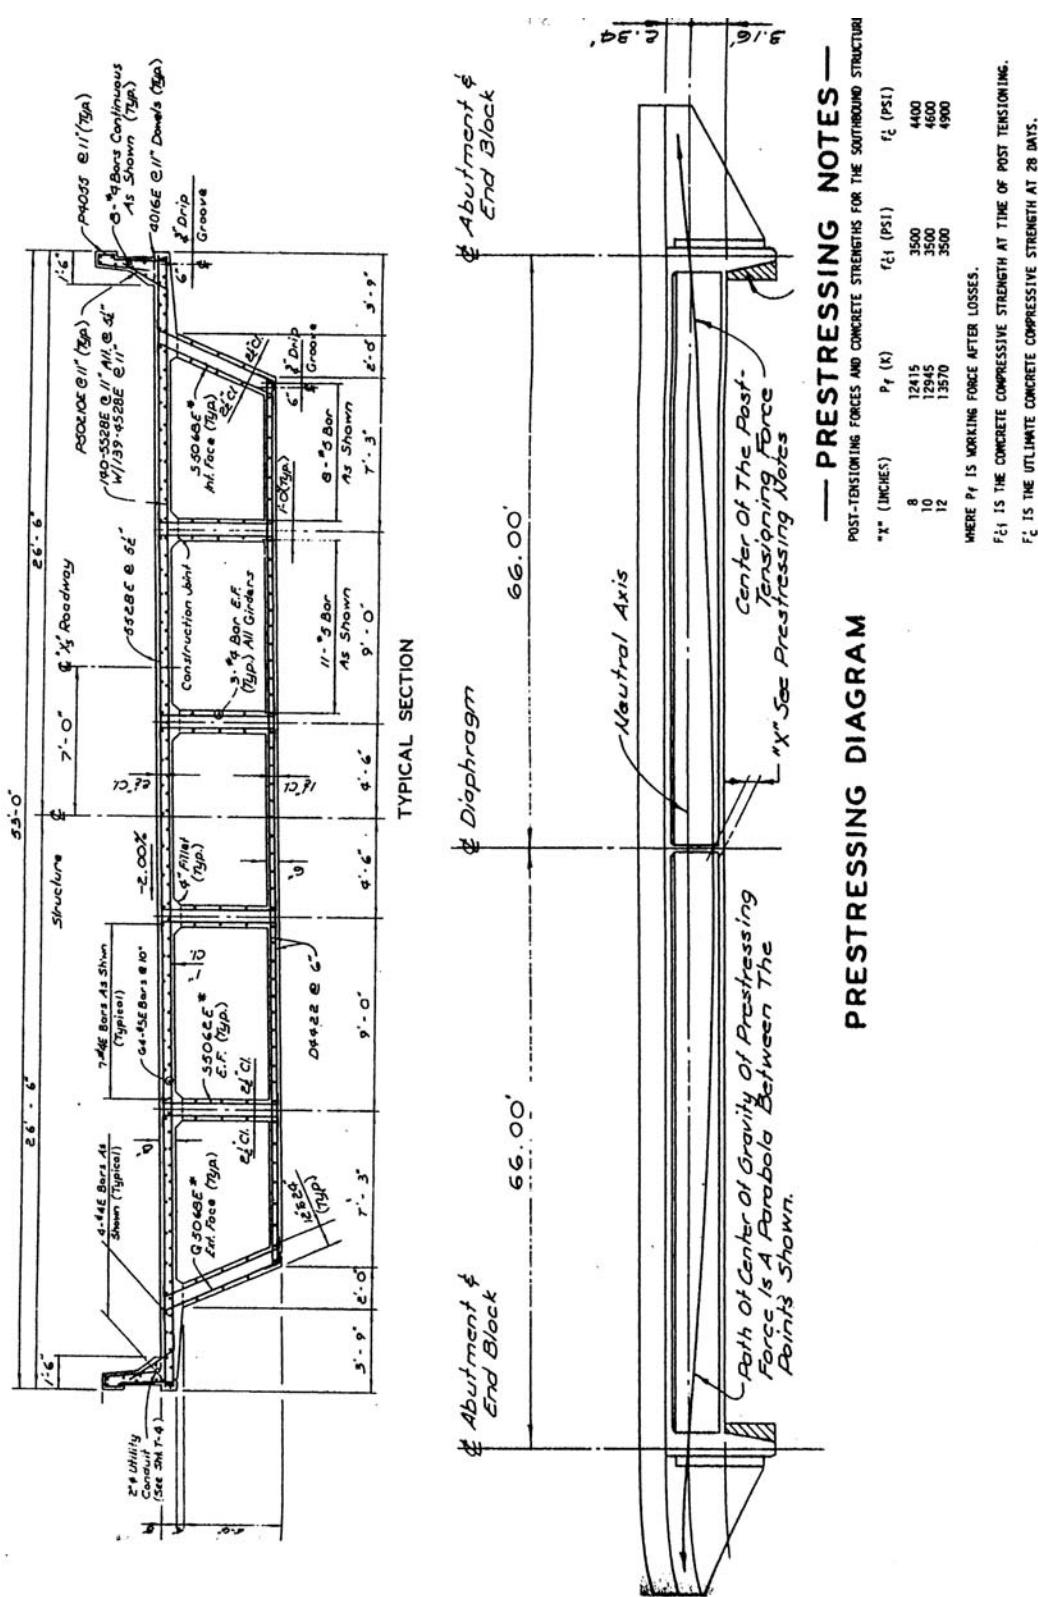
Bridge G1697S Typical Section and Prestressing Diagram
